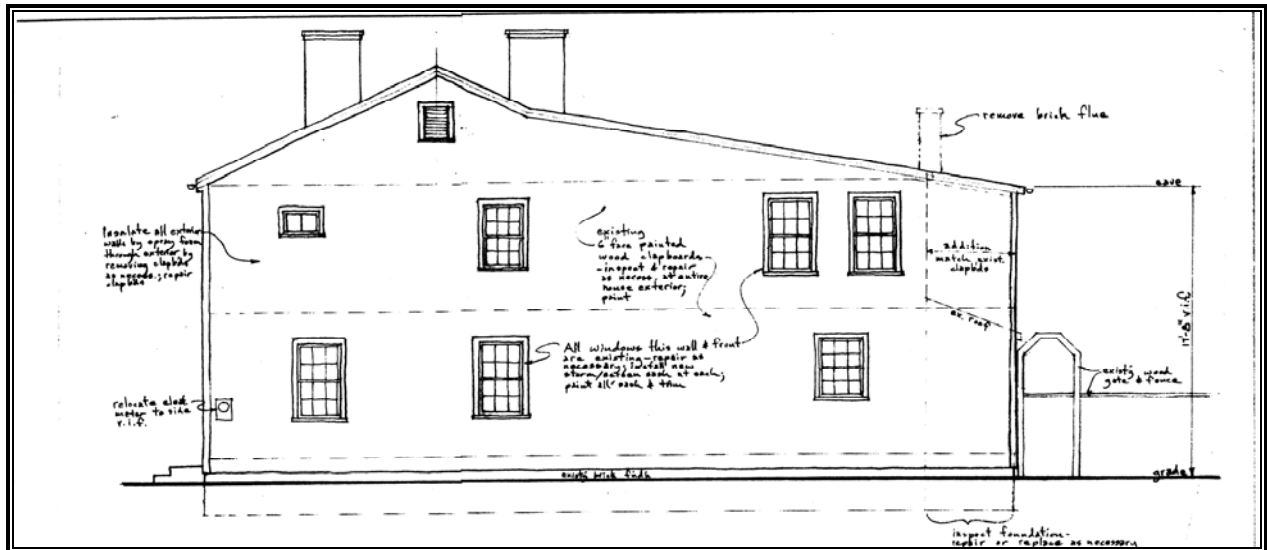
Elevation from September 3, 2008 BAR submission showing rear chimney
